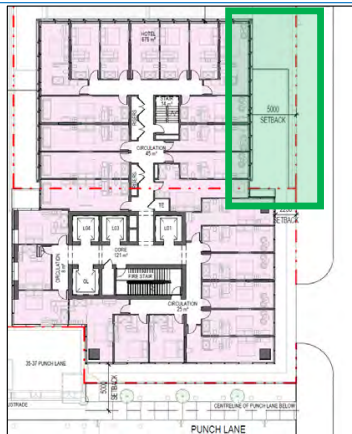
Proposed 5 m Lonsdale Street setback above the street wall (within DDO10)
